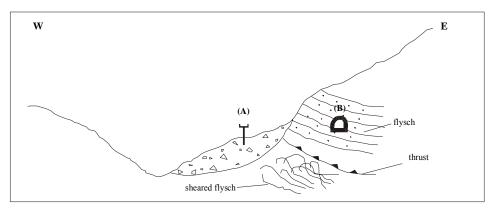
Section Anilio - west portal of Metsovo tunnel. Geotechnical problem: foundation of initially proposed long viaduc bridge in deep (40m) active landslide of flysch (A). Solution: avoiding of the whole unstable area with the construction of tunnel with a length of 2.120m (B) (not scaled).
